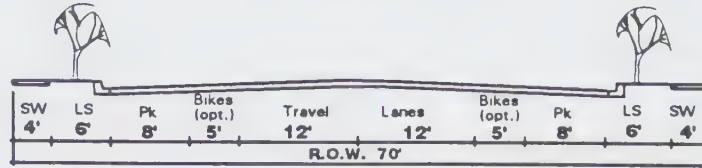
, Street Standards Cross Sections. Revise per attached figures 3-3a and 3-3b, adding the additional standards described by this addendum to the cross sections shown for local streets.
